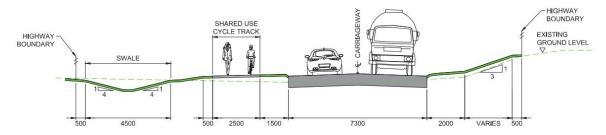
HCC Typical Section (Realigned Highbridge Road – Option H4 & 2A)
